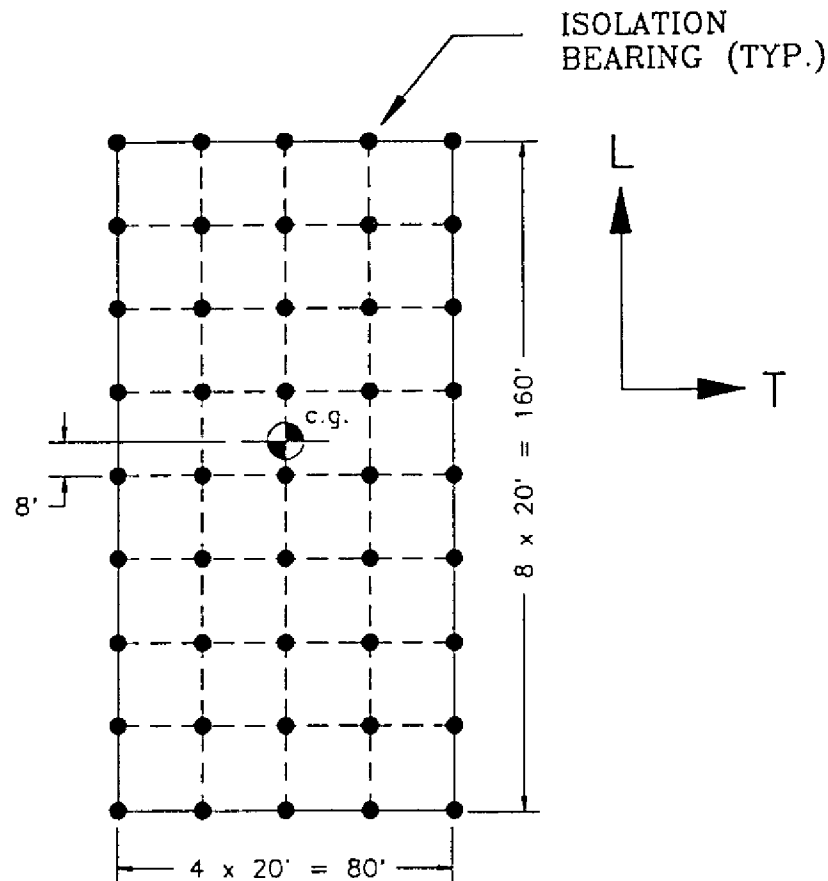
Plan View of the Base of the Building Models and Location of the Isolation Bearings
